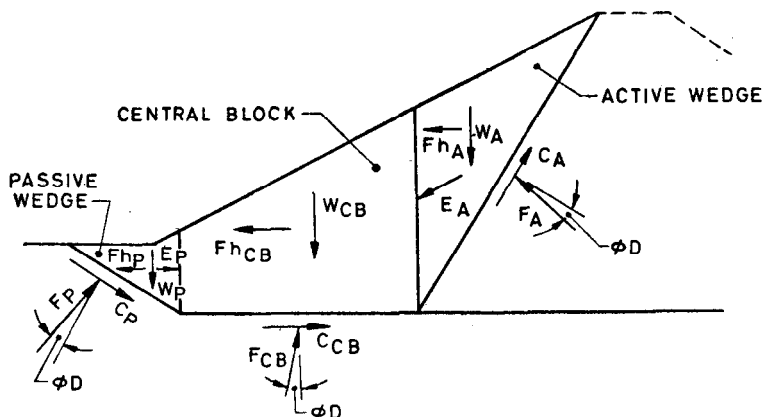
DAM SECTION SHOWING WEDGES AND EARTHQUAKE FORCES
